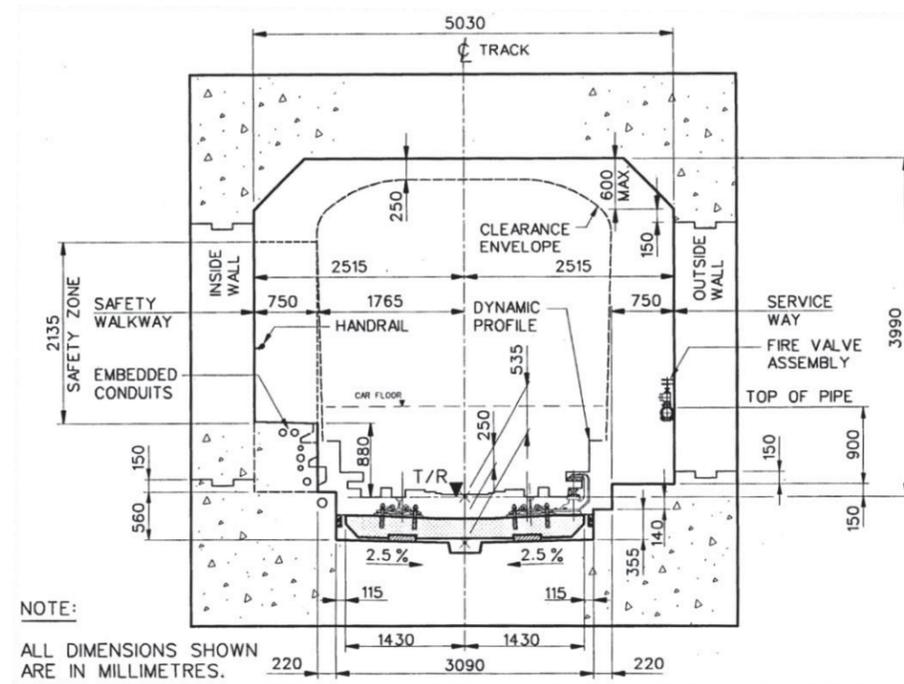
Typical Single Box Section – Double Tie, Tangent Track (Source: TTC DM-0205-01)
